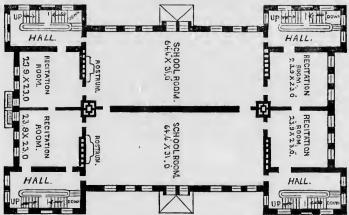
Plan of the First Floor or Second Storey of Fig. 211.
